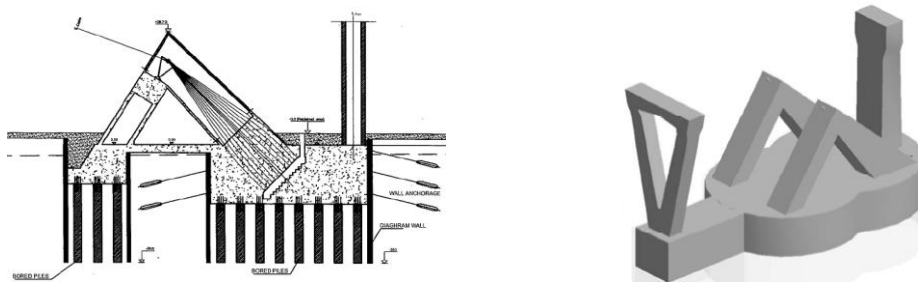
(a) Conceptual design of Tender design for South anchor block; (b) Alternative plan
